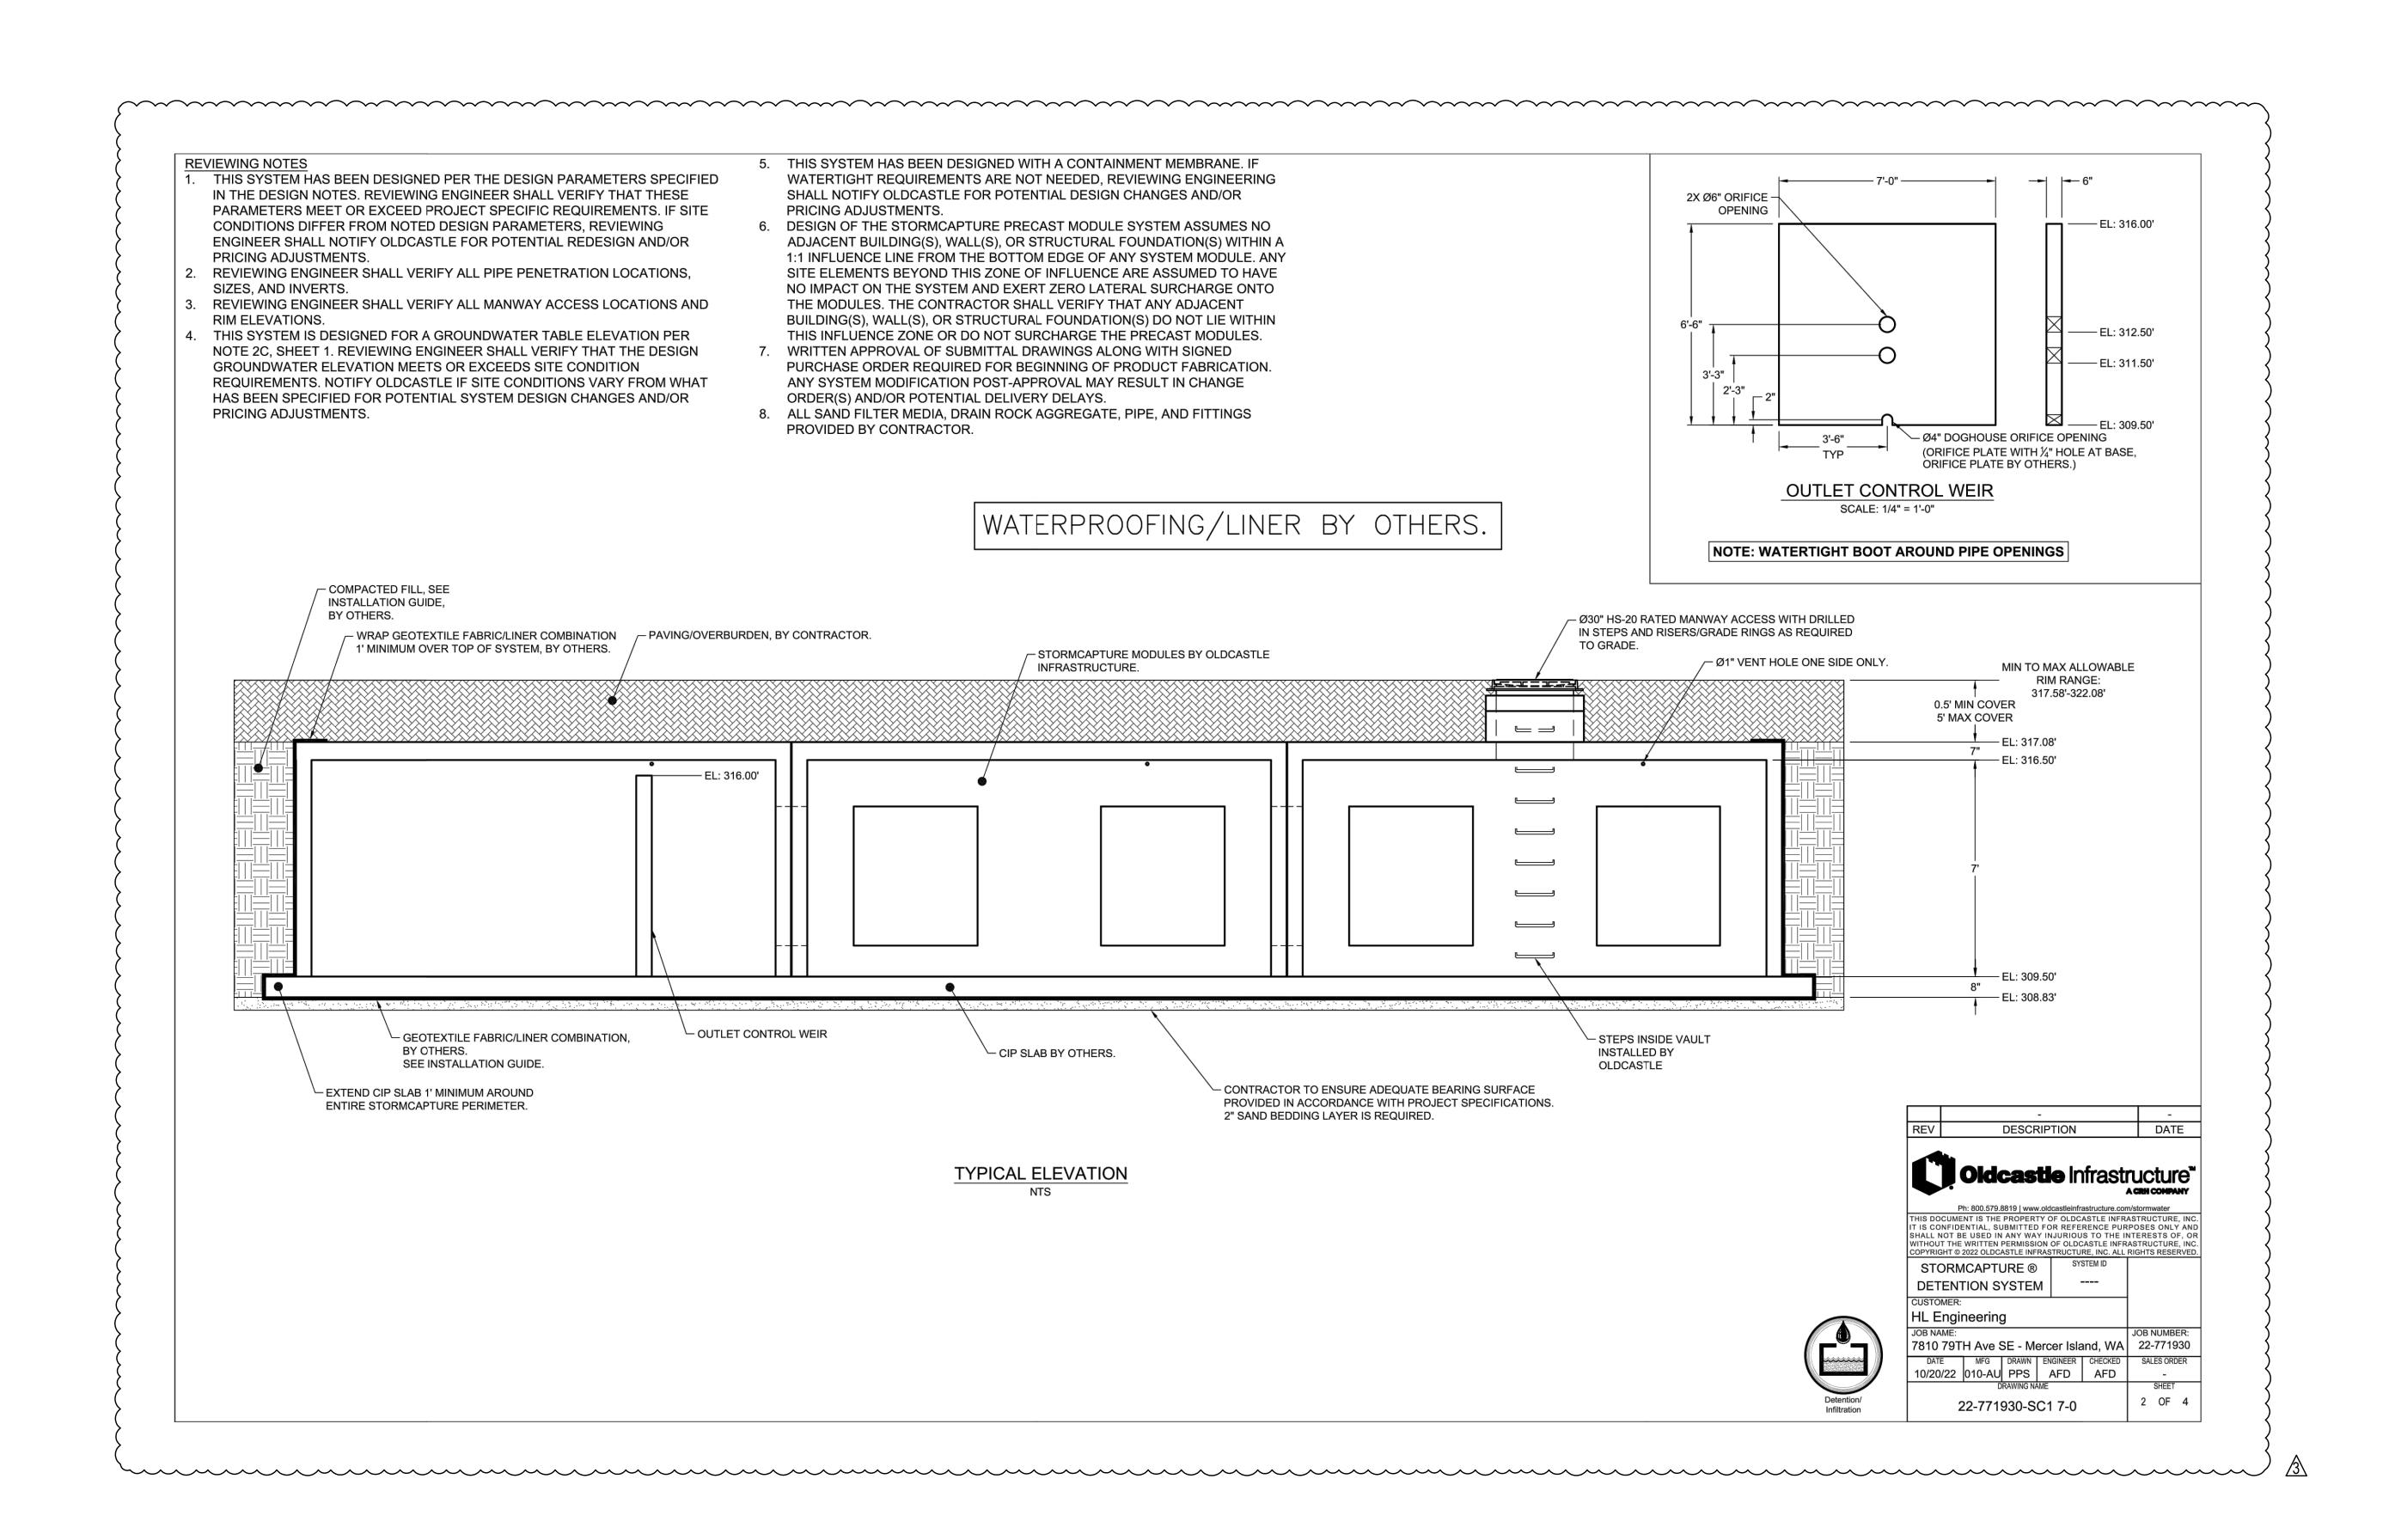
DETAIL: STORMWATER DETENTION MODULE PLAN DETAIL NO.: 1 REF SHEET: C4.00
